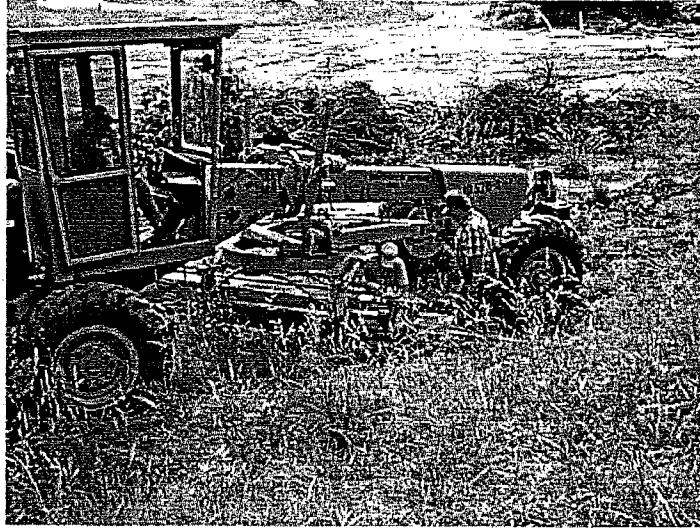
Testing of pipe gripping mechanism using a motor grader.
